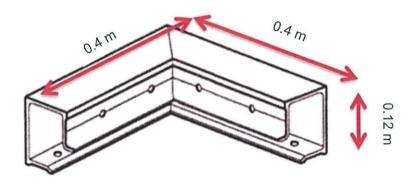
Internal Soffit Corner Source: architectjaved.com (n.d)
